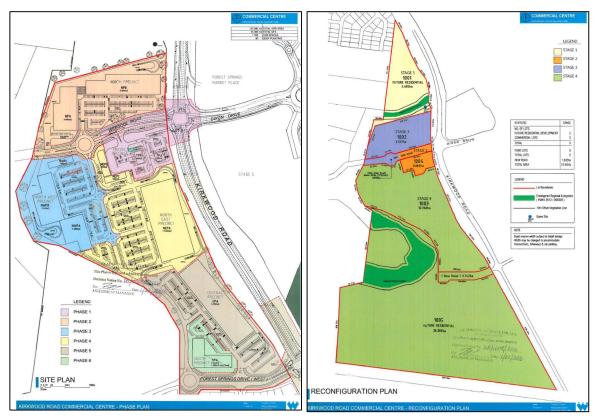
Approved Phase Plan & Reconfiguration Plan (Source: Walker Corporation Pty Ltd, 2016)
